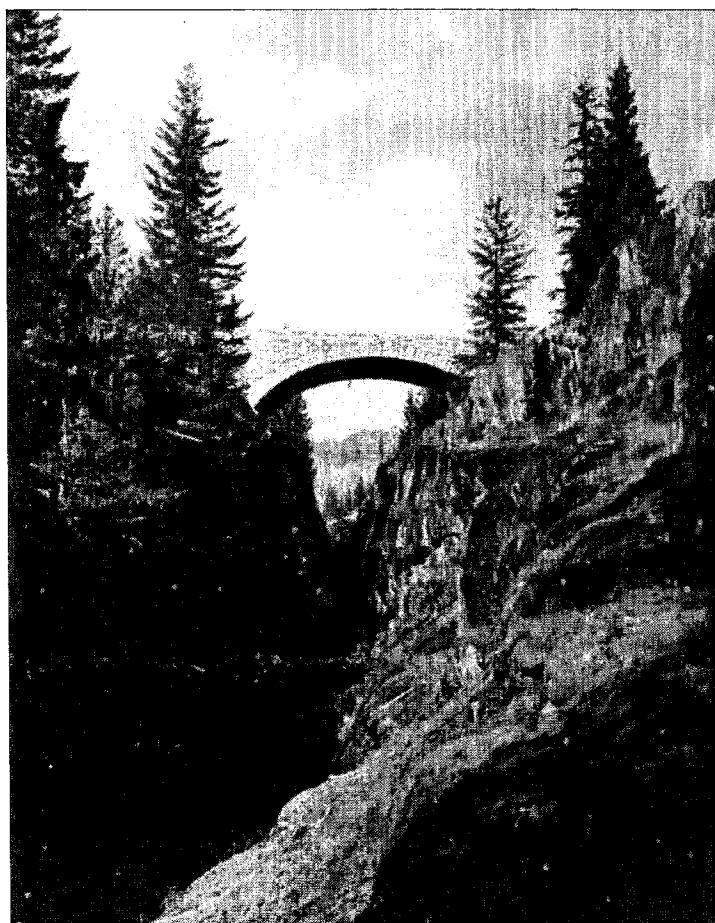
Historic photo showing Box Canyon Muddy Fork Bridge, 1963 (MORA Archive).
